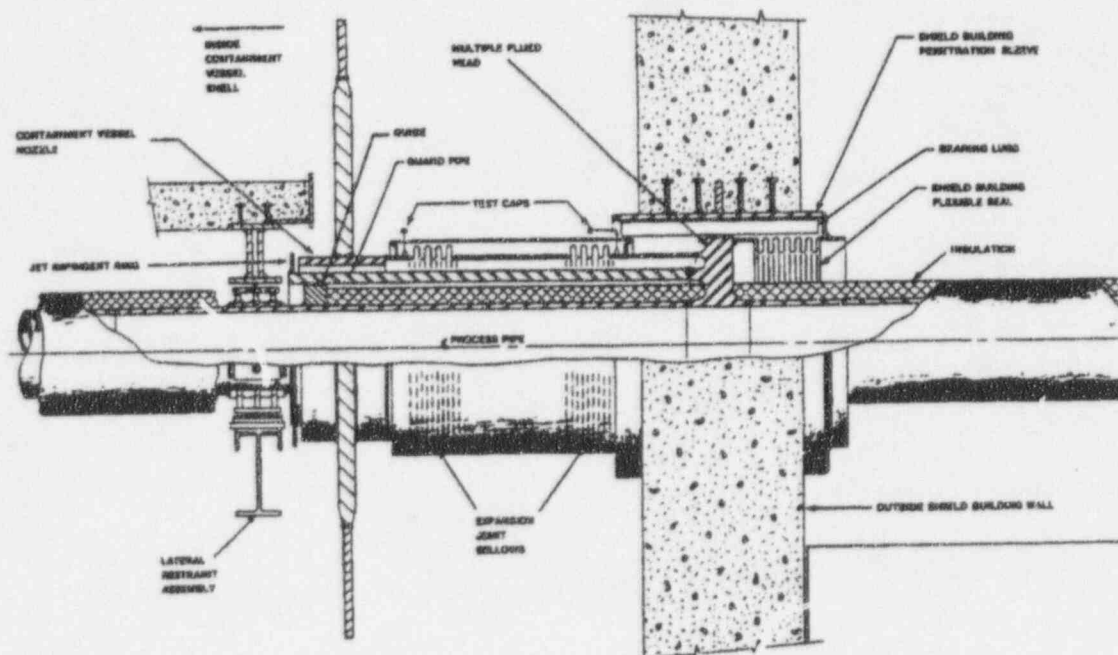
Concrete Containment Mechanical Piping Penetrations
